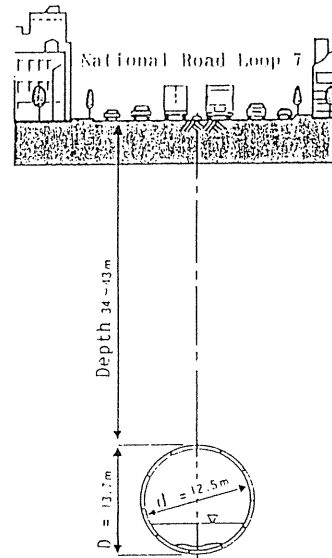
Typical cross section (Source: Tokyo Metropolitan Government Office).
